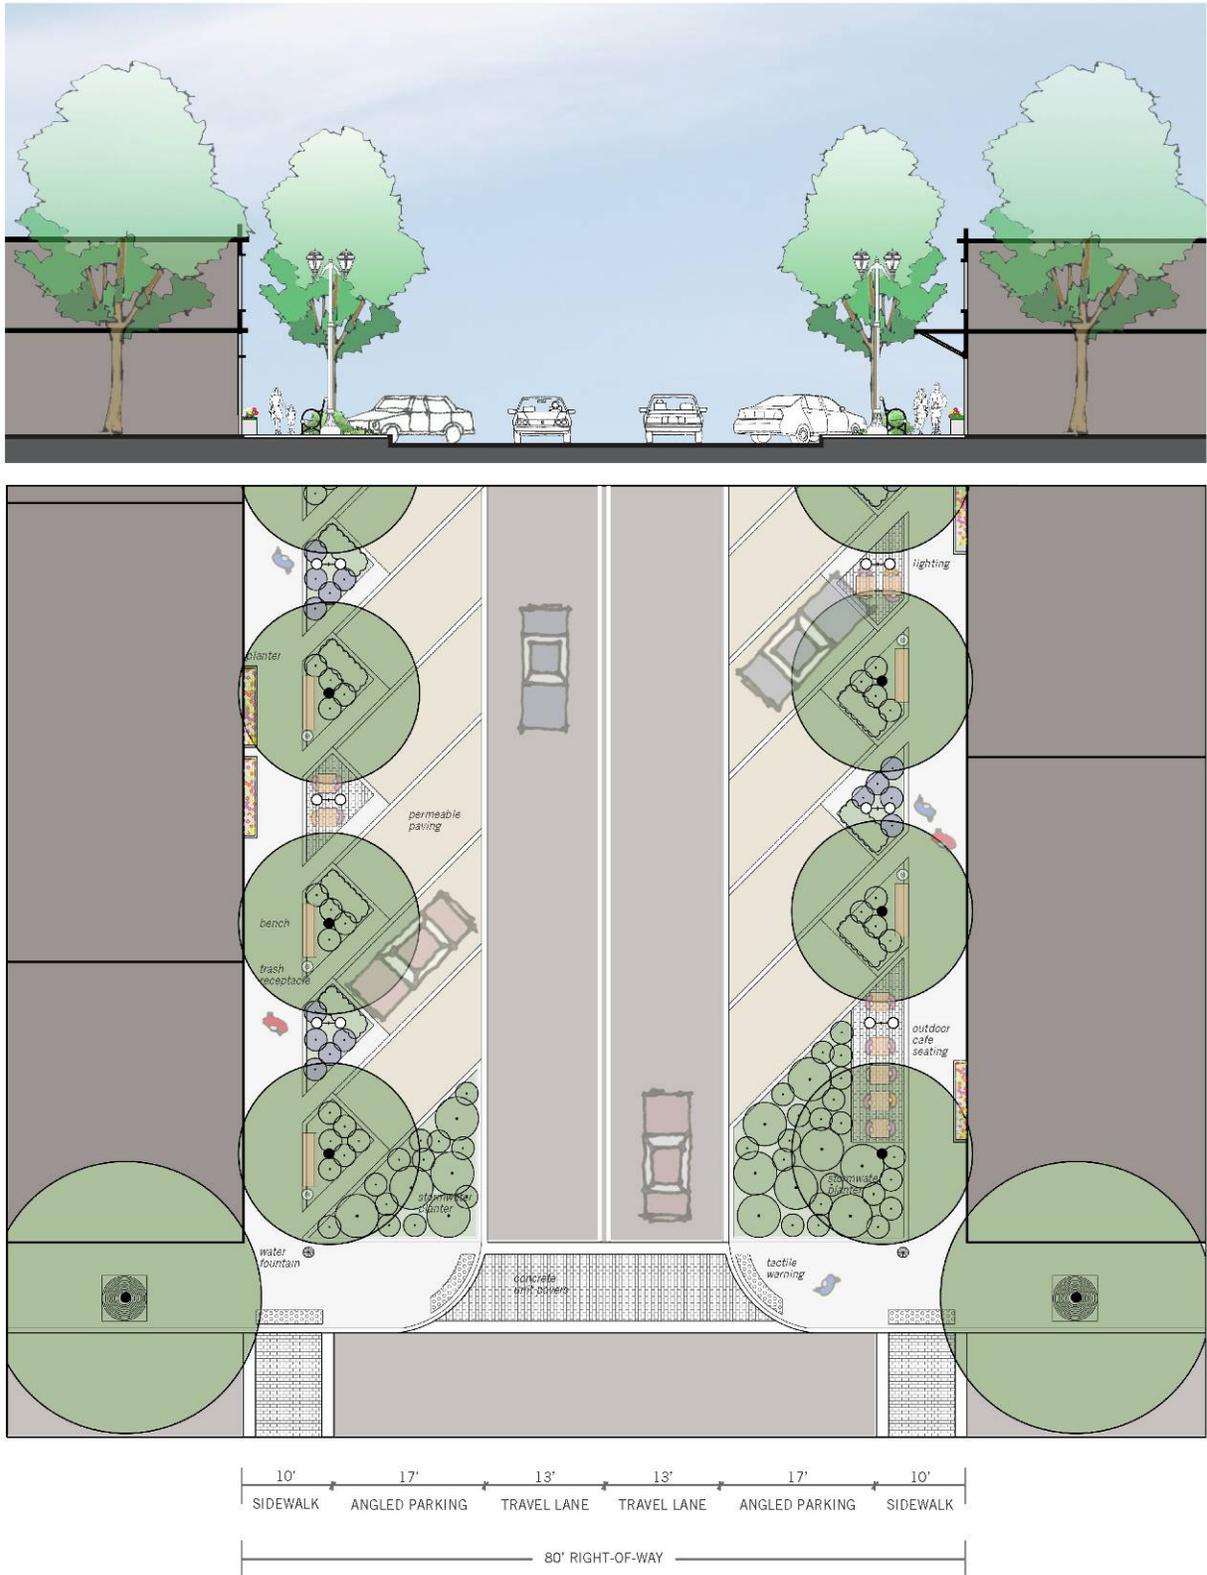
Broadway Street Proposed Streetscape Improvements – Option A
